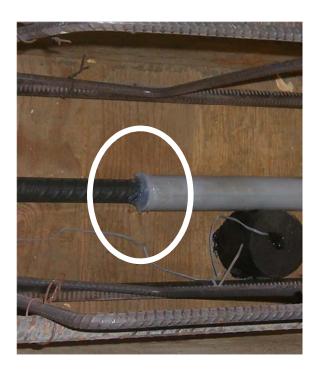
PVC Pipe and Caulk Terminating Bond Length.
